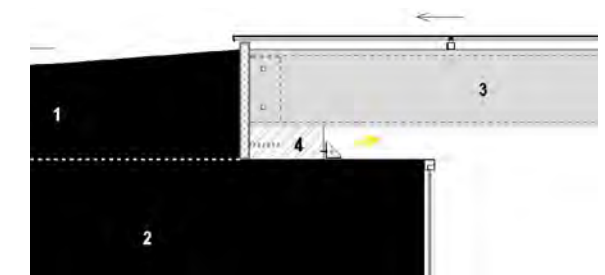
Skylight and earth volume connection. (1) Insulated, bitumen impregnated earth; (2) Unstabilized poured earth; (3) Steel beams; (4) Concrete bond beam
